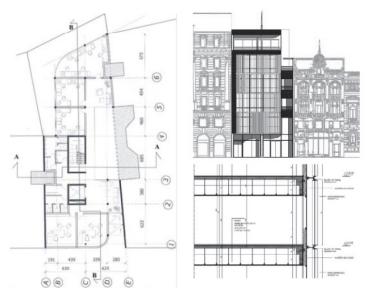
Plan of a typical floor, elevation and cross-section of the street facade of Model 3
